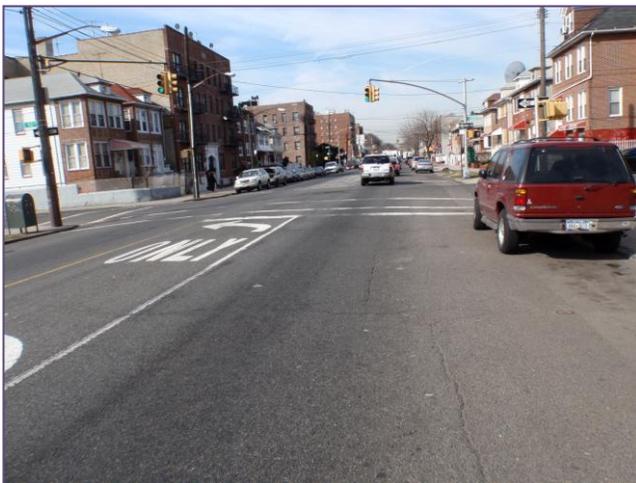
Linden Boulevard and E 52nd Street (looking west)
